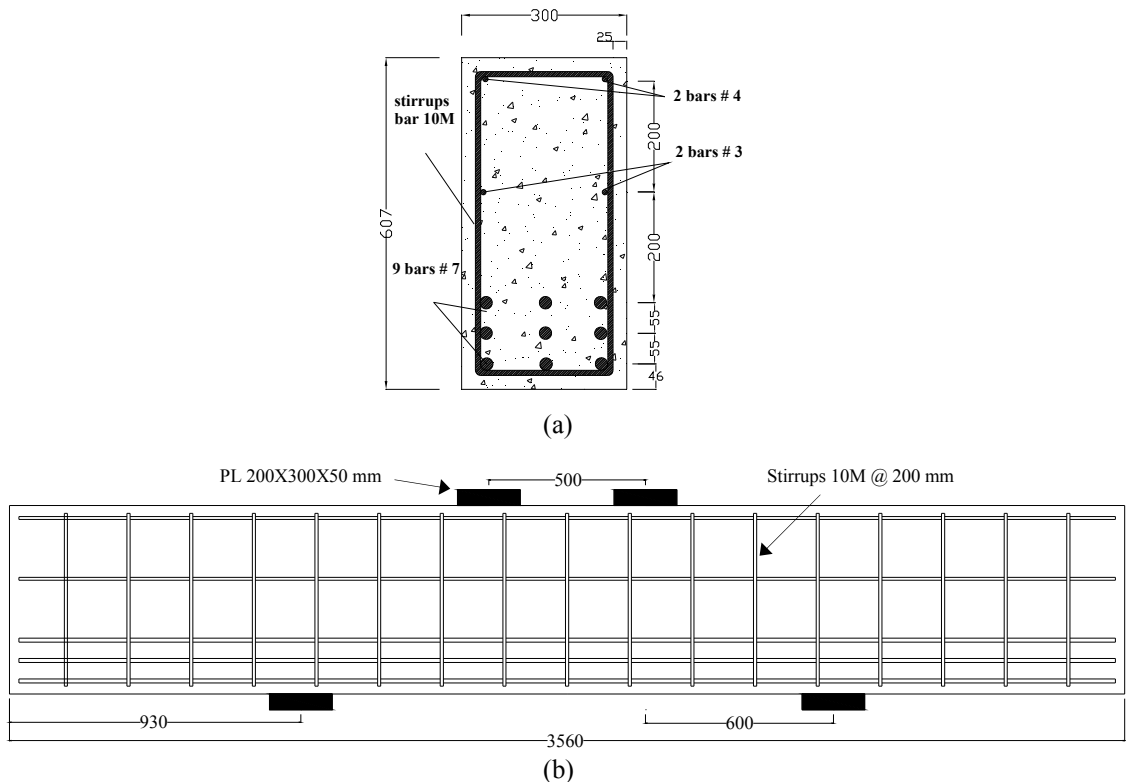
Beam MS1-3: (a) Cross section (b) Elevation
